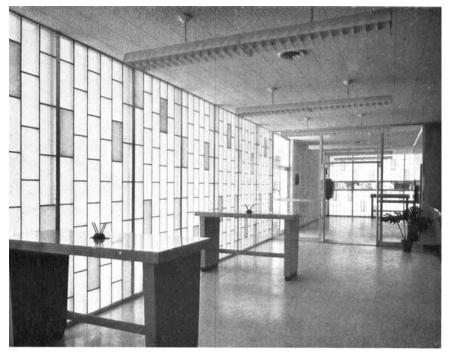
Translucent sandwich wall panels with glass fiber reinforced polyester facings on aluminium grid core. (Kalwall)
